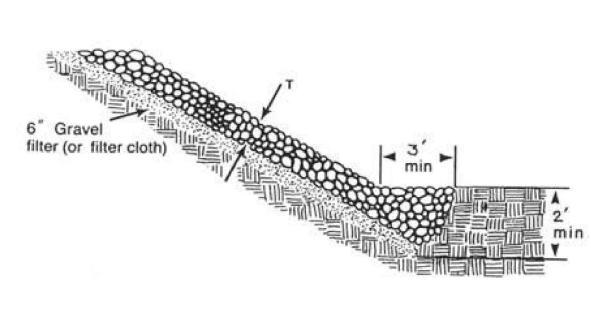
Typical Riprap Slope Protection Detail
